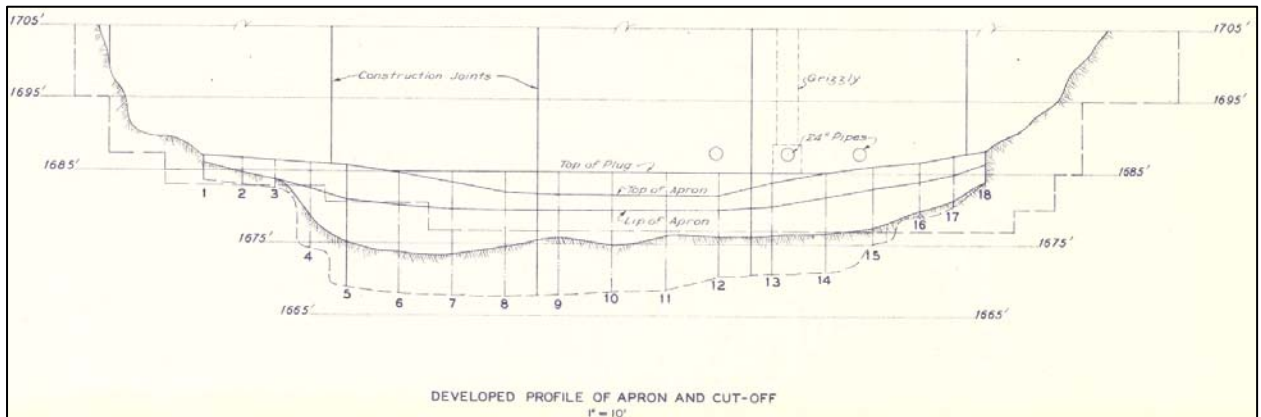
Profile of apron and cut-off wall at Brown Mountain Dam.
